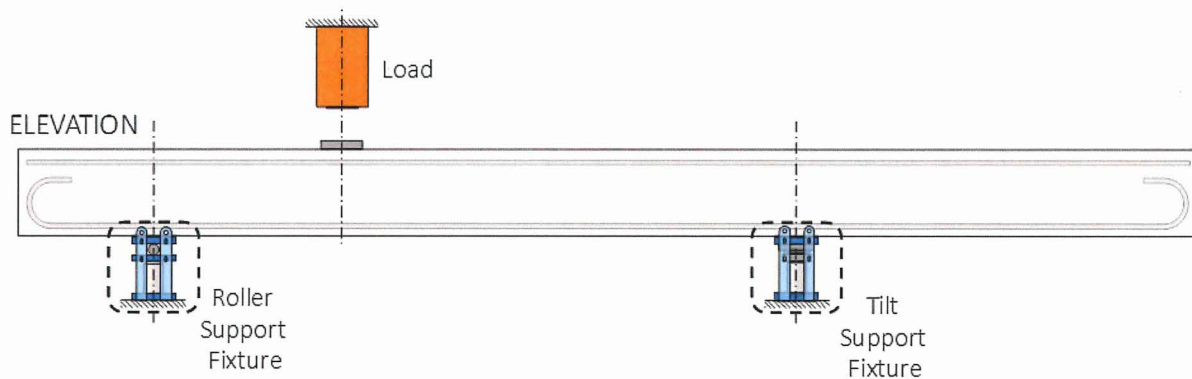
Test Setup for [REDACTED]-inch Shear Test Specimens (Elevation View)
